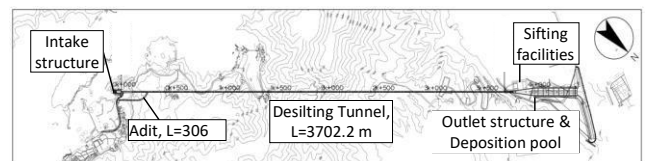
Plan view of the sediment desilting tunnel at Shimen Reservoir
